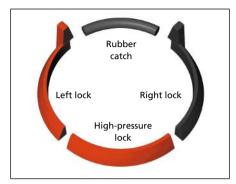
Layout of the locks and the rubber catch in the BLS®/VRS®-T joint (DN 80 to DN 500 nominal sizes); high-pressure lock only for DN 80 to DN 250 nominal sizes
